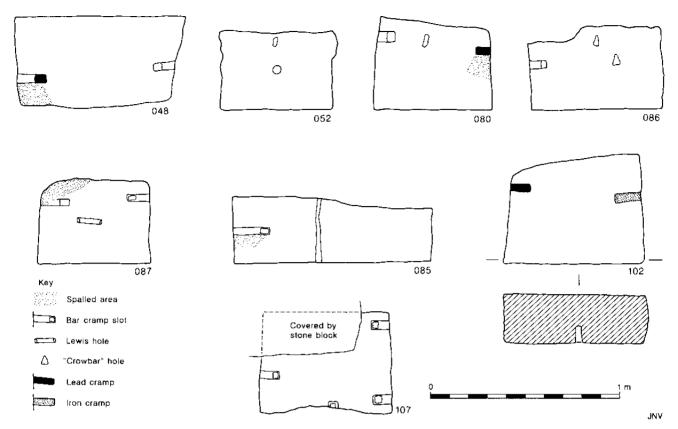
Reused blocks from the collapsed curtain wall in Area F
